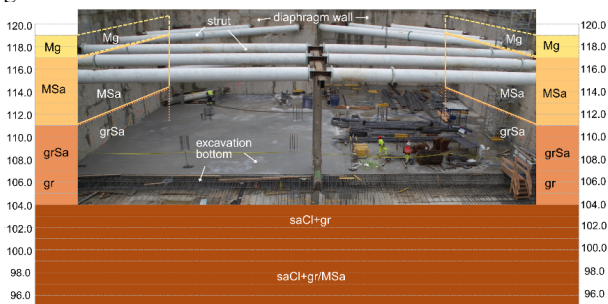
Diaphragm walls supported by struts - the cross-section of the excavation and geotechnical conditions.
